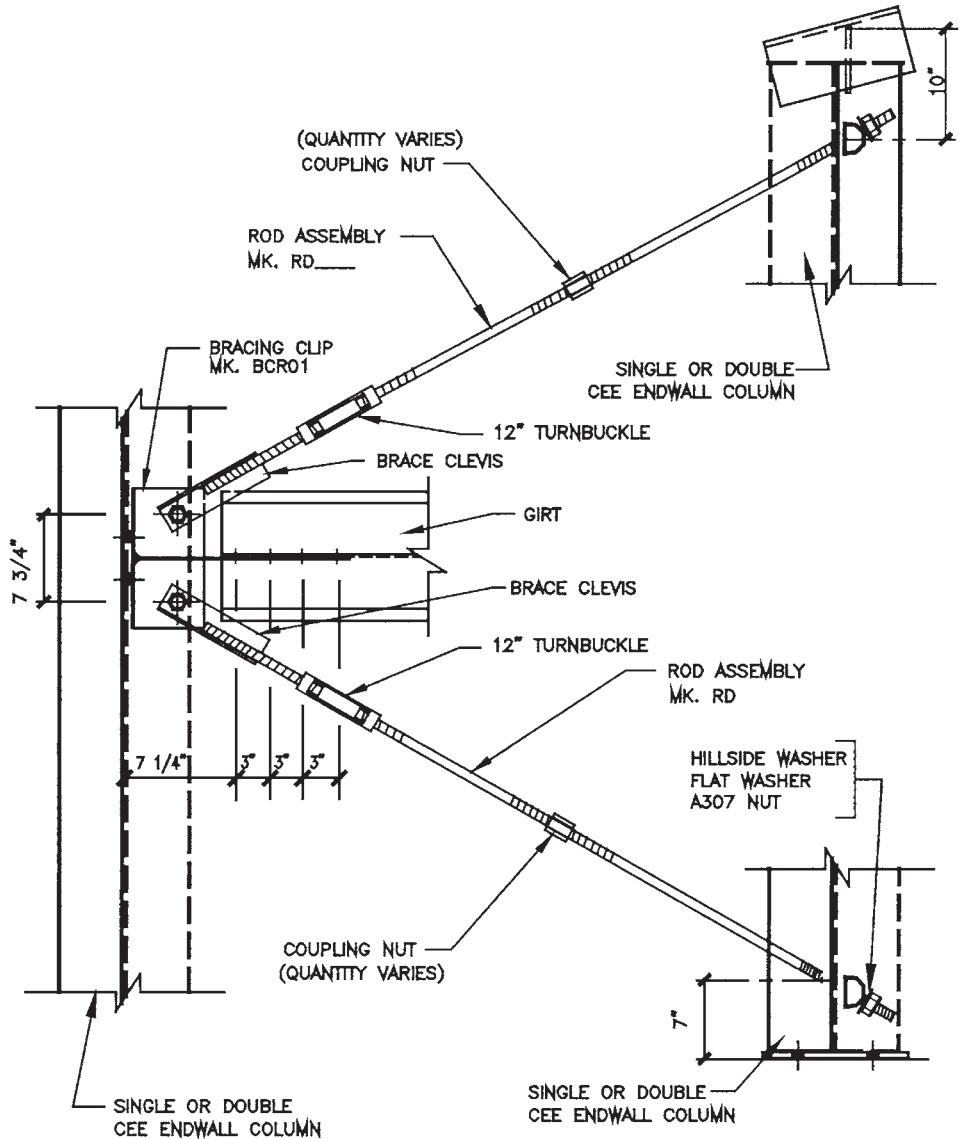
Detail of tiered rod brace. (Nucor Building Systems.)
